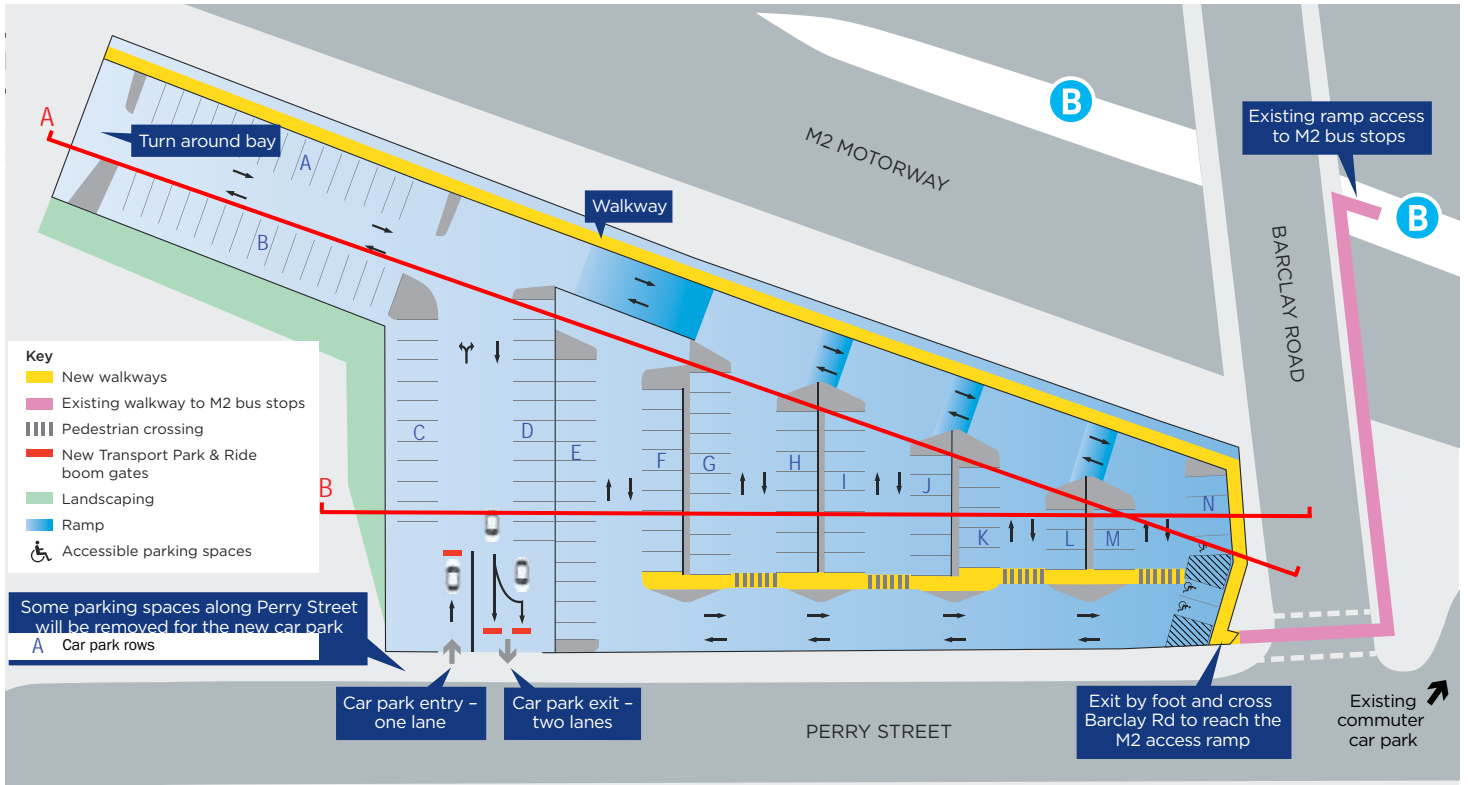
Concept Design (subject to planning approval and detailed design).
